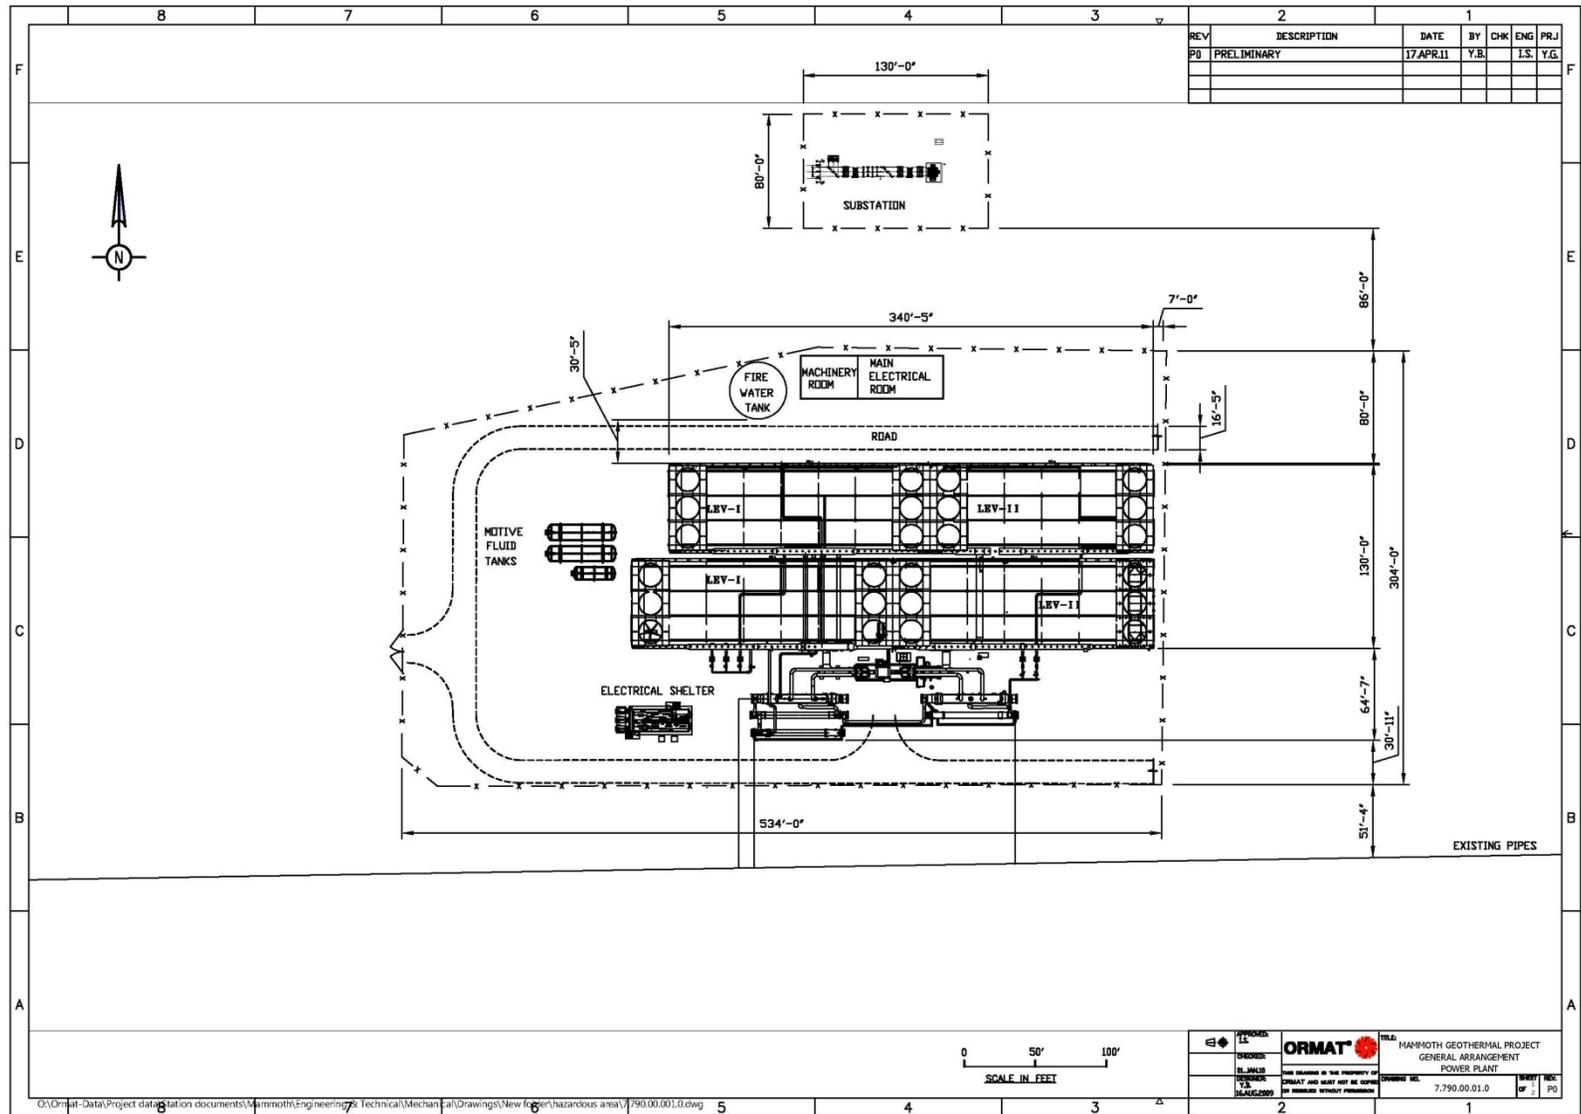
General Arrangement of Proposed M-1 Power Plant Facilities
